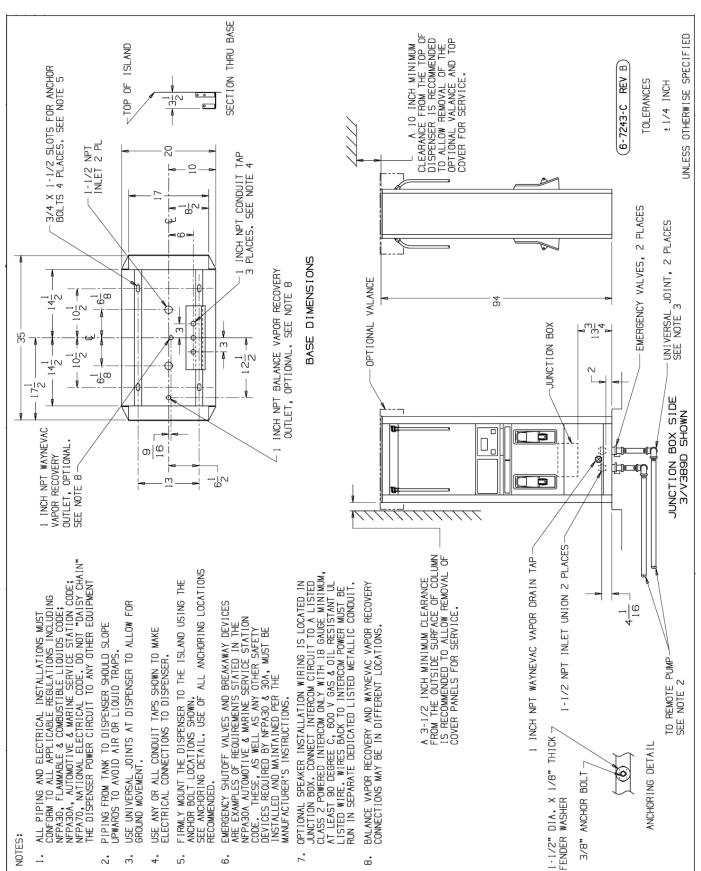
6-7243-C Installation Instructions - 4/V388D and 4/V389D(Remote)
